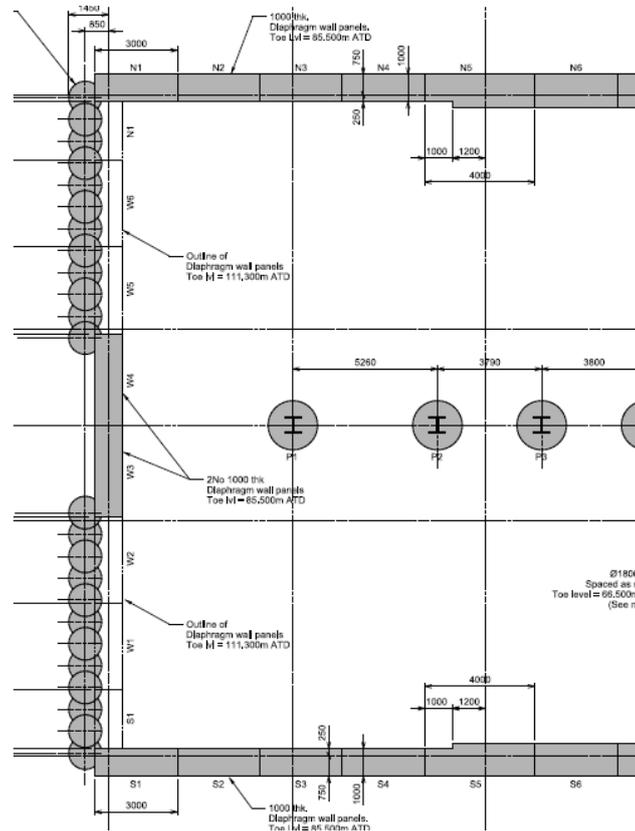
“Soft” secant wall / diaphragm wall arrangement
